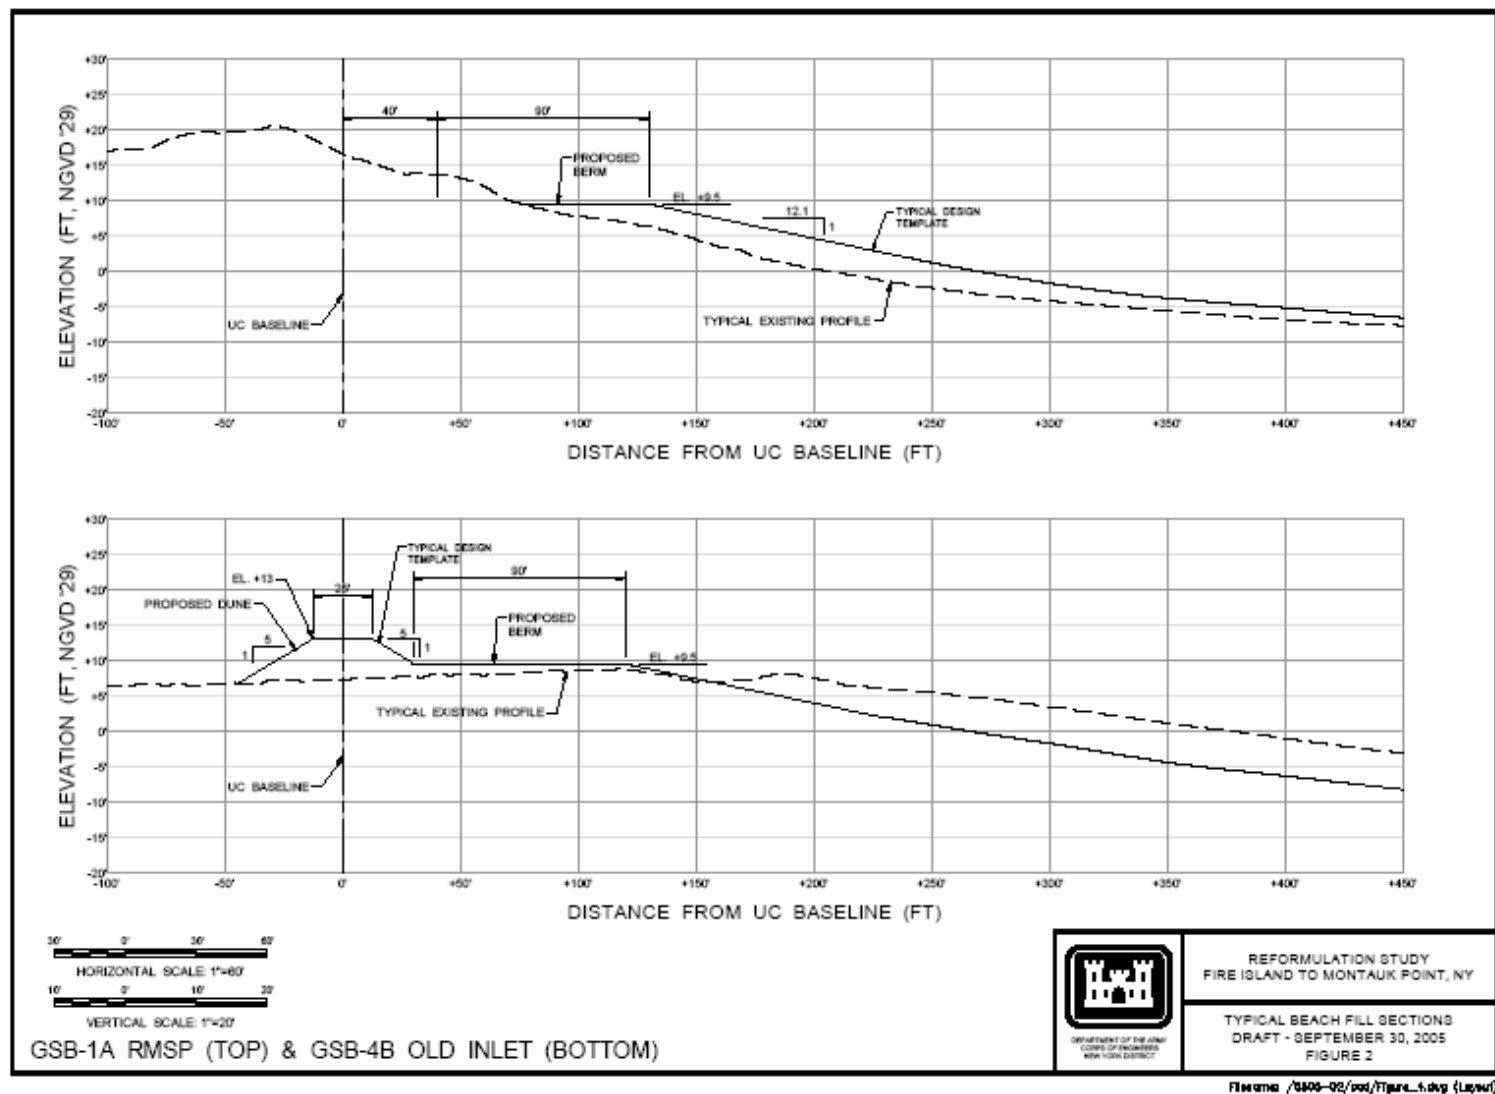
Typical Beachfill Section at GSB-1A, GSB-4B
